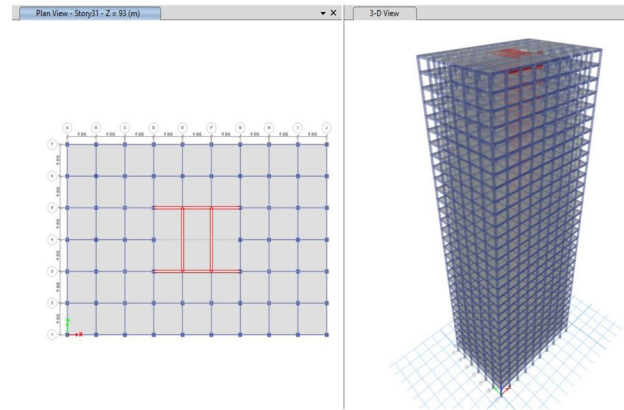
Model-9: Building with shear wall located at the centre in I-shape
